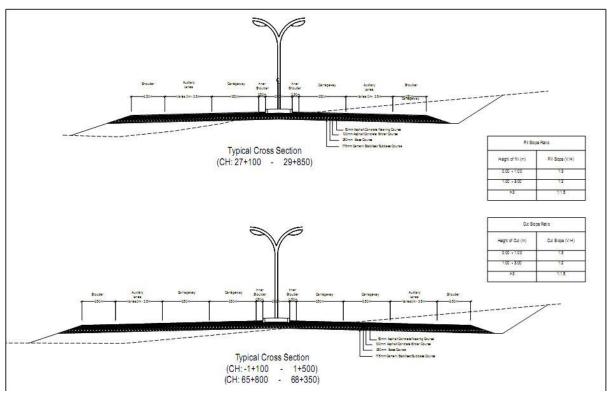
Typical Cross-Sections of Project Roads 1 & 3
